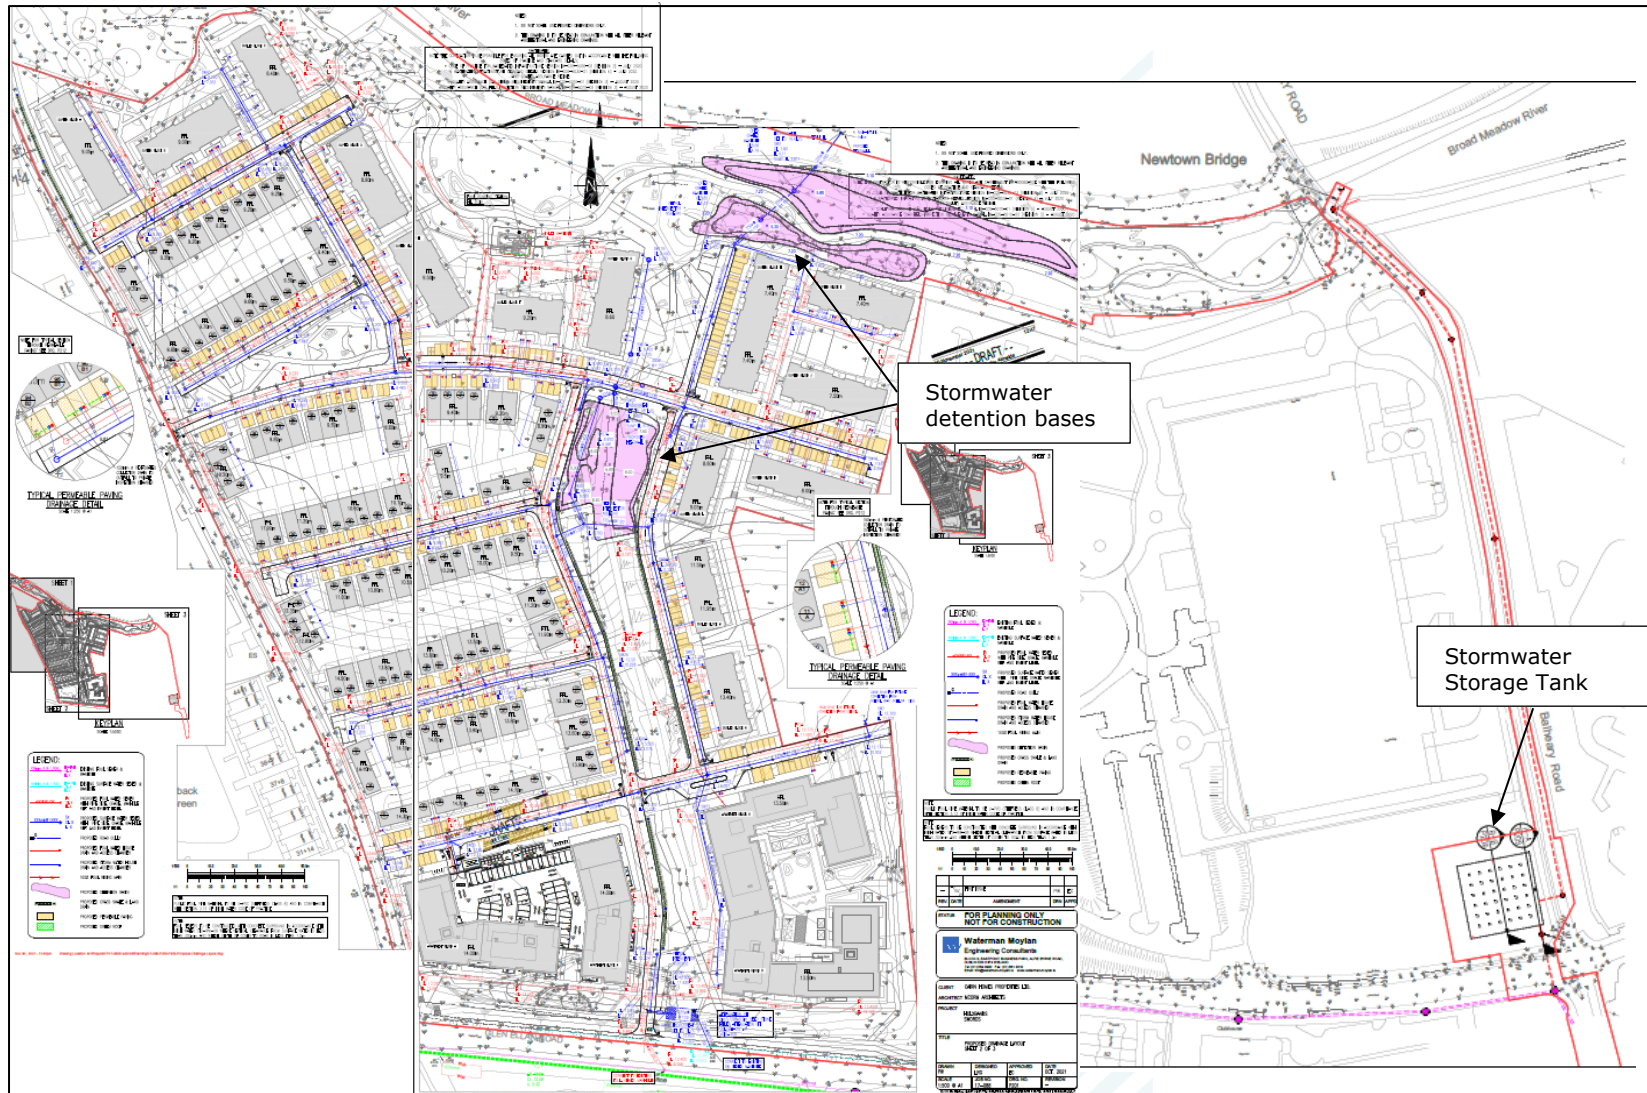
Proposed stormwater design (source: Waterman Moylan Consulting Engineers)
